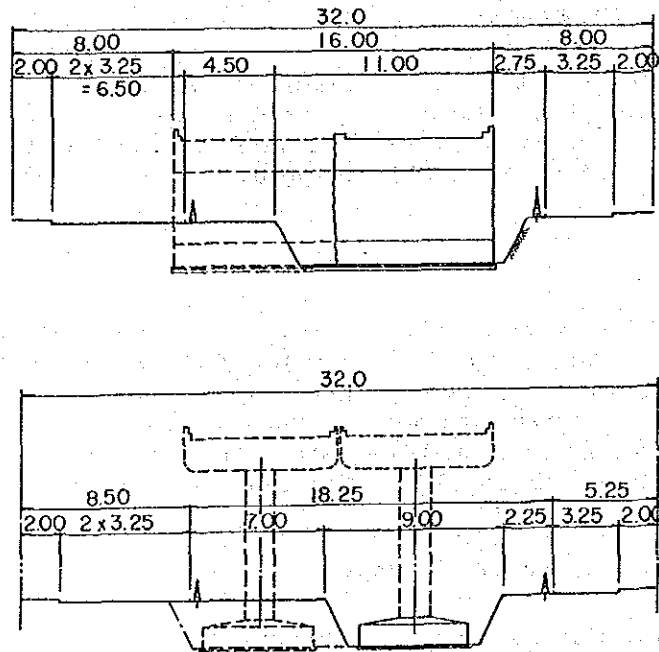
TEMPORARY CROSS SECTION OF R. DE FRANCIA AVENUE FOR CONSTRUCTION OF VIADUCT
